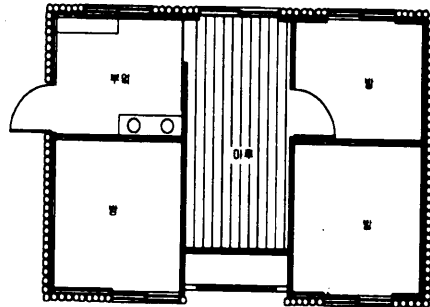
Floor plan of Return House for The sufferers by 4.3 matter
